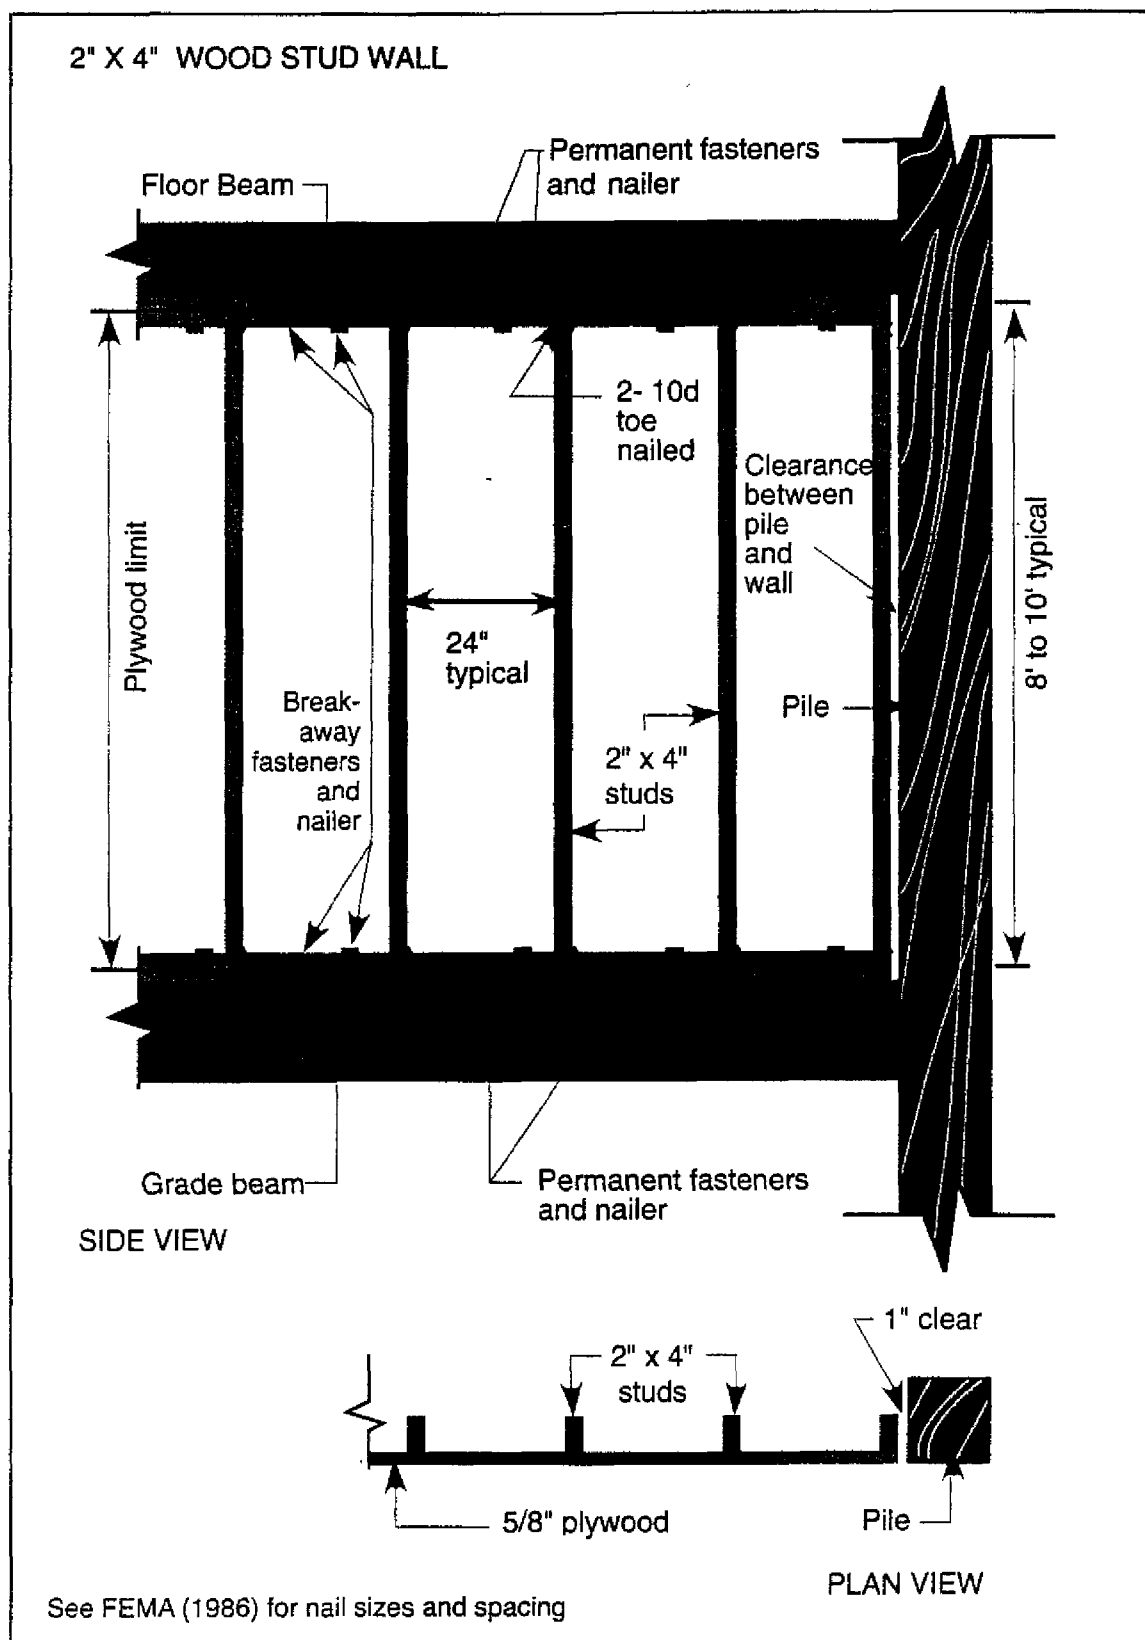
Wood stud breakaway wall (after FEMA 1986).
